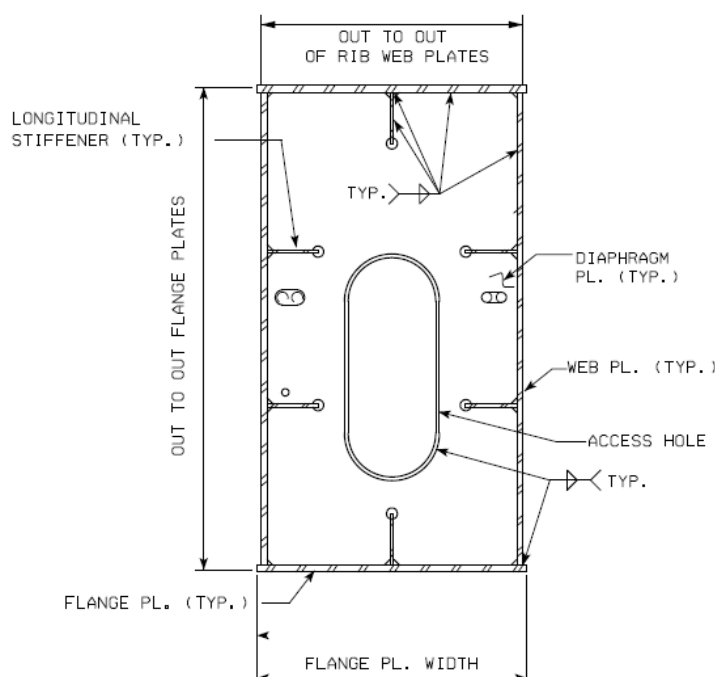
Typical Cross Section of an Arch Rib
